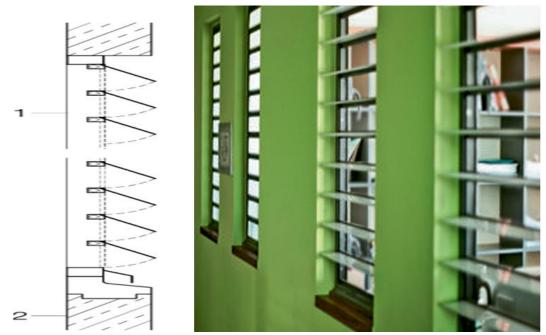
Section, wall with louvered windows, scale 1:20 (Voss et al., 2013)
